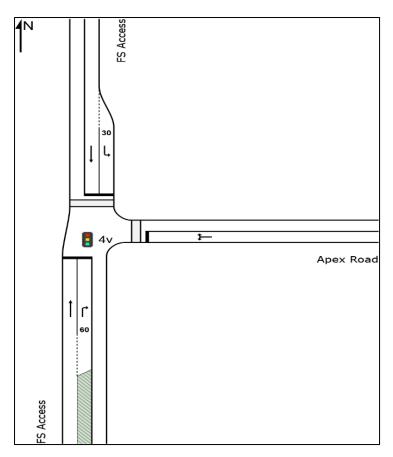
Intersection 4 Proposed Layout (Background Traffic)
